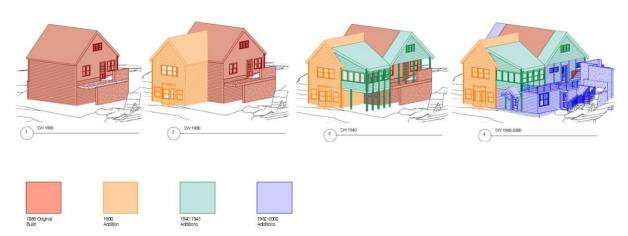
Applicant's illustration showing various additions to the Historic Structure at 218 Sandridge Road.
